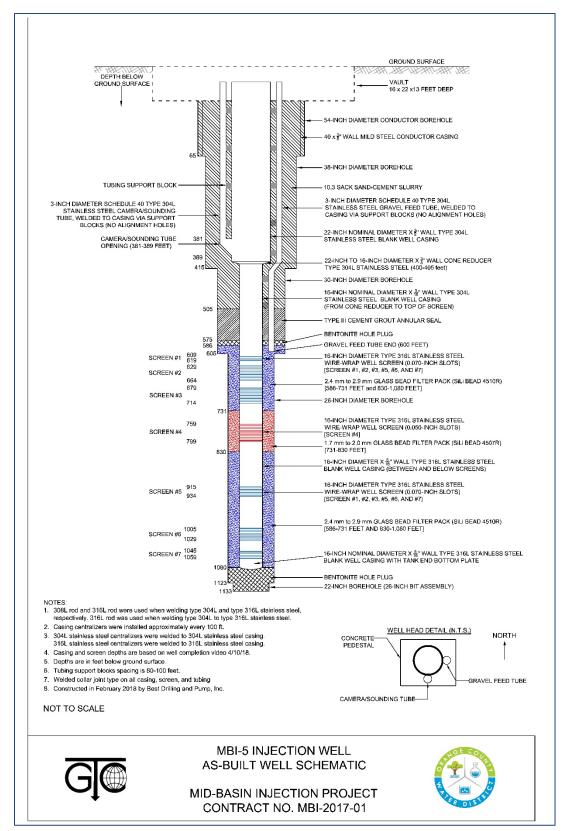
Injection Well MBI-5 As-Built Construction Diagram
